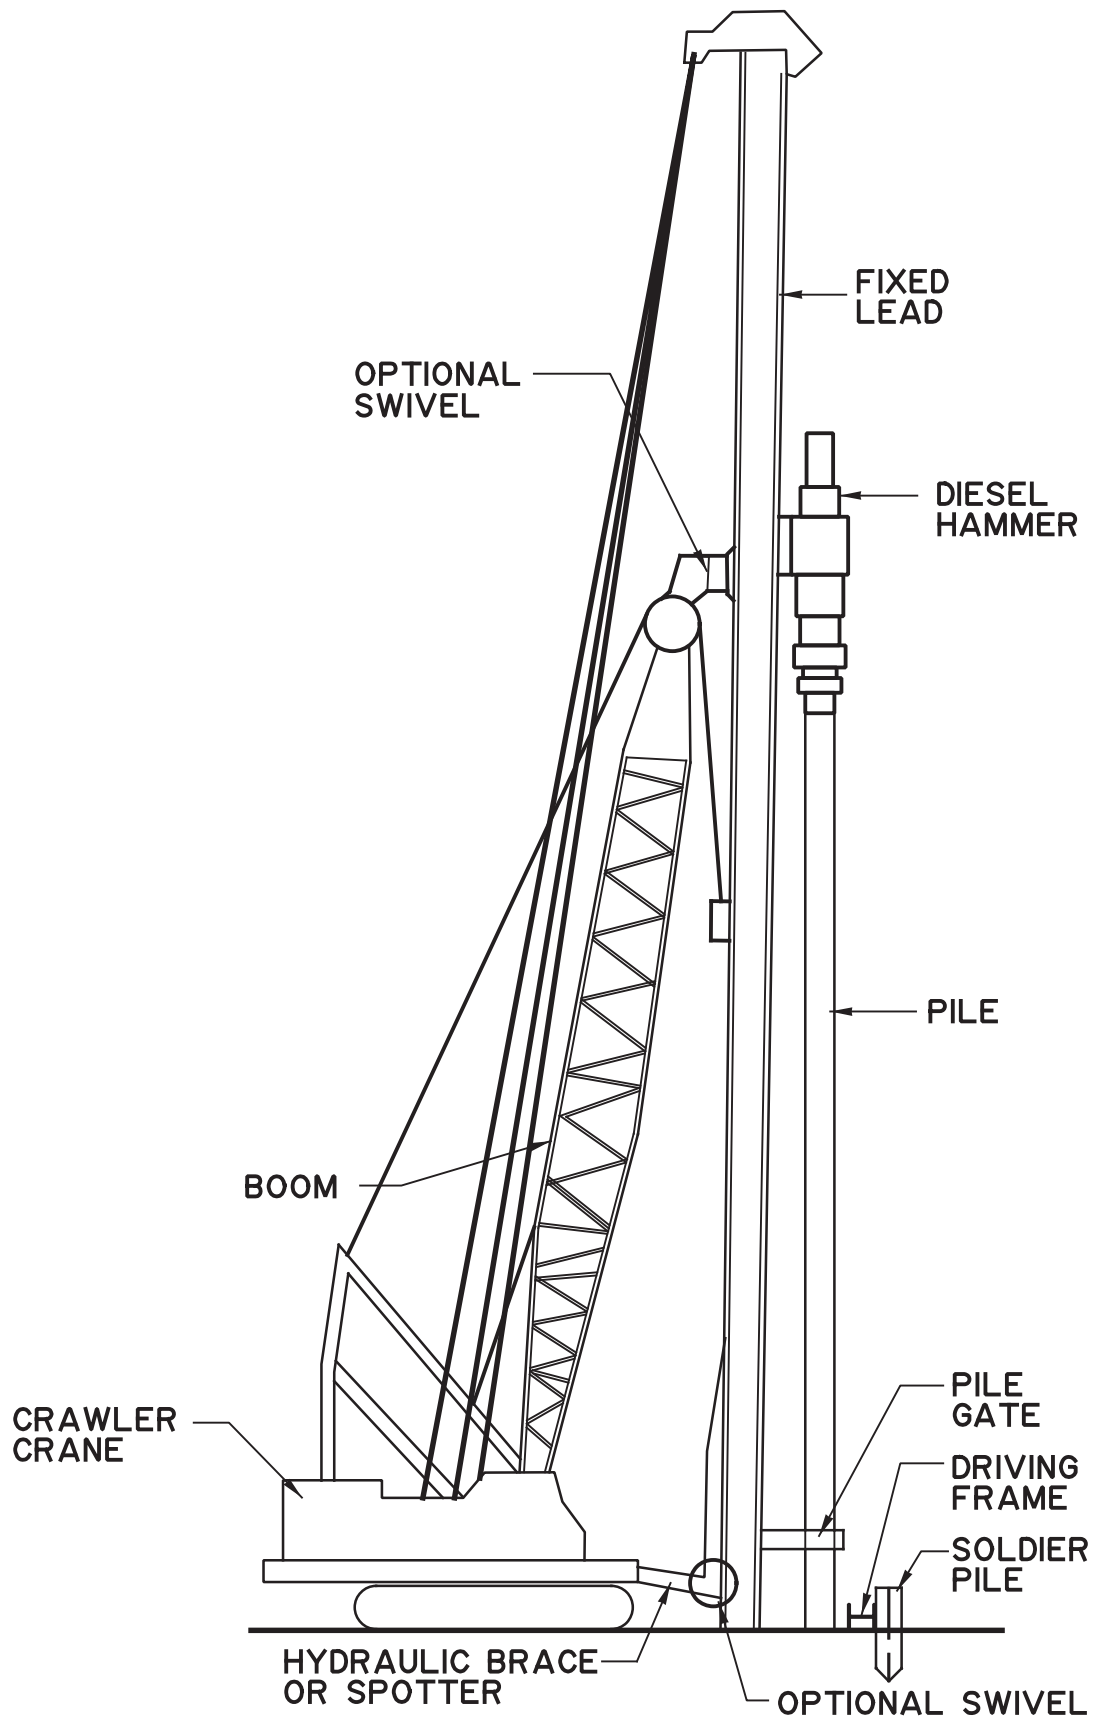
TYPICAL DIESEL PILE DRIVING HAMMER AND FIXED LEAD
